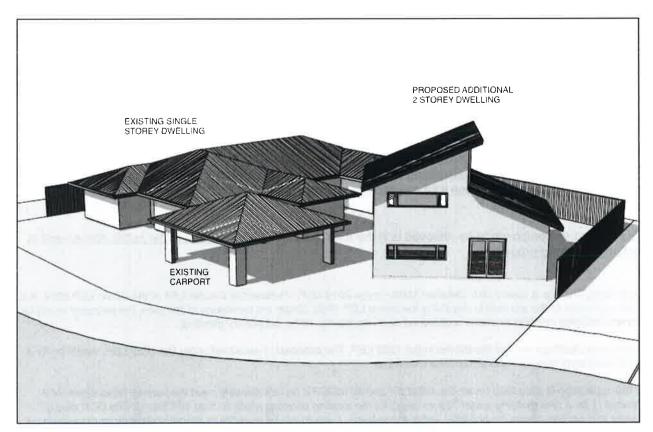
The proposed built form - 3D perspective view showing dominant scale of new dwelling
